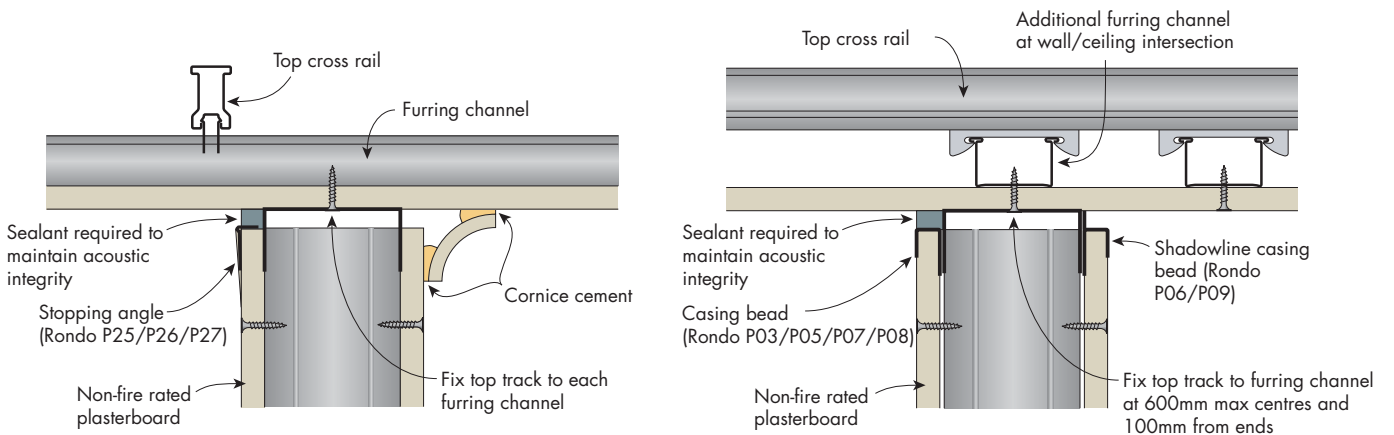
Wall Head to Suspended Ceiling Finishing Detail
